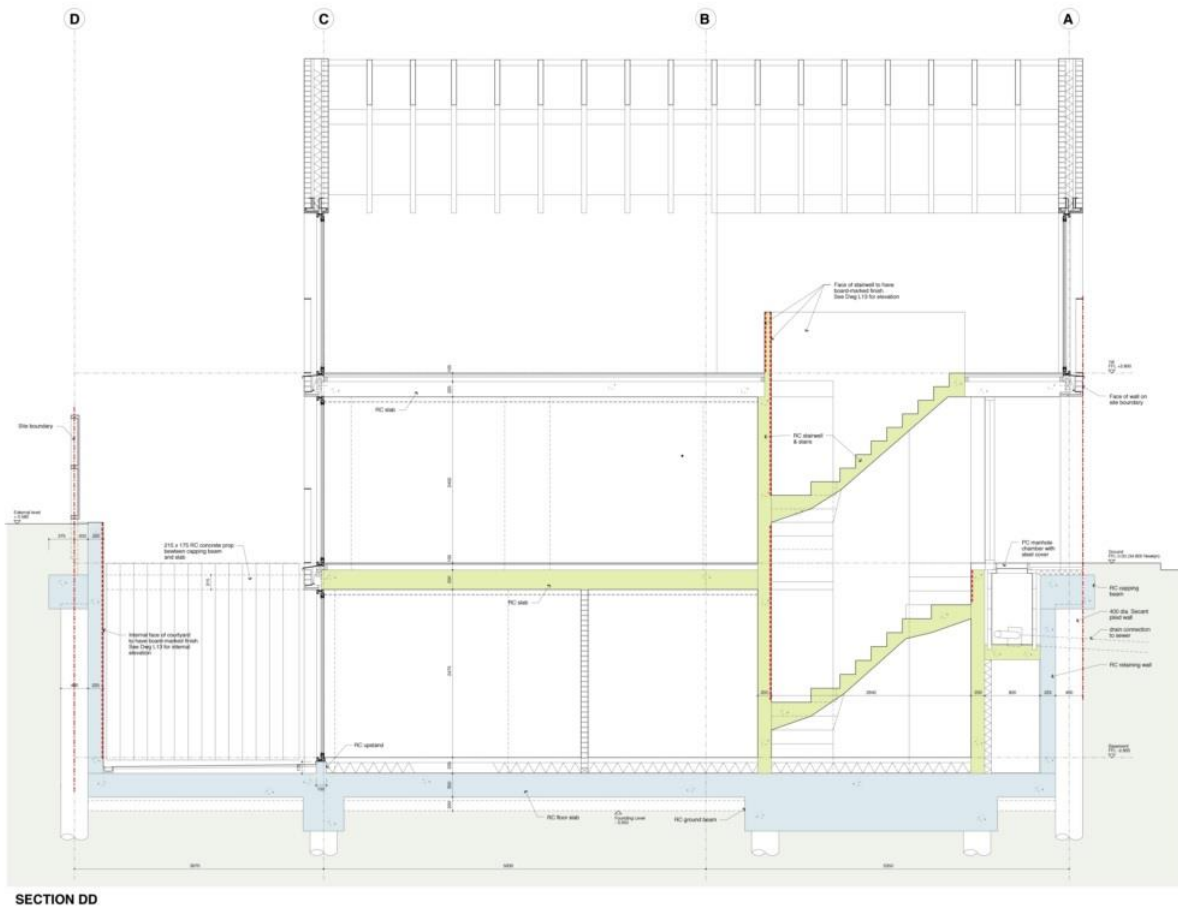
Cross section through the proposed development showing the above and below ground structure. Adapted from BHA Ltd drawing 1590\_L08\_T2
